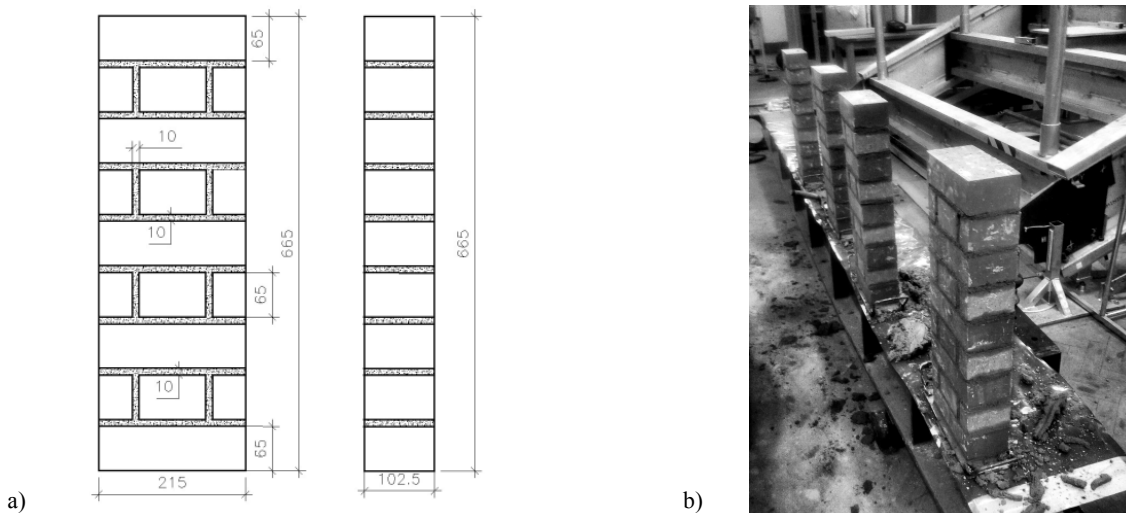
Plain Masonry Prism: (a) Drawing (front and side view), (b) As-built specimen
